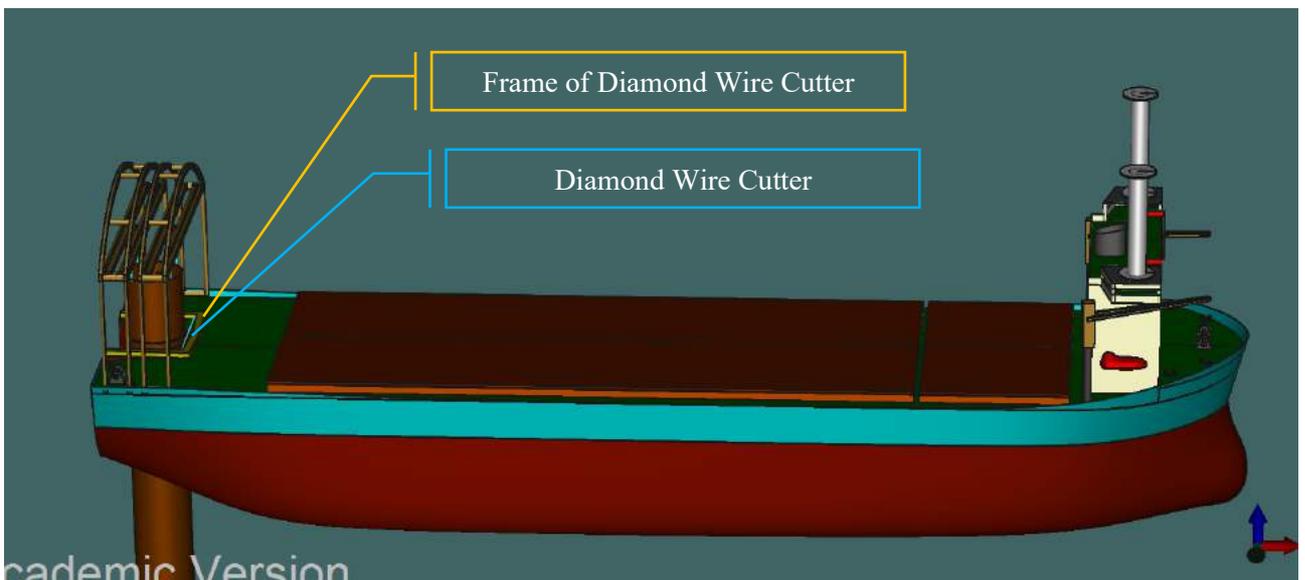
Cutting of Extracted monopile has been completed by Diamond wire cutter
